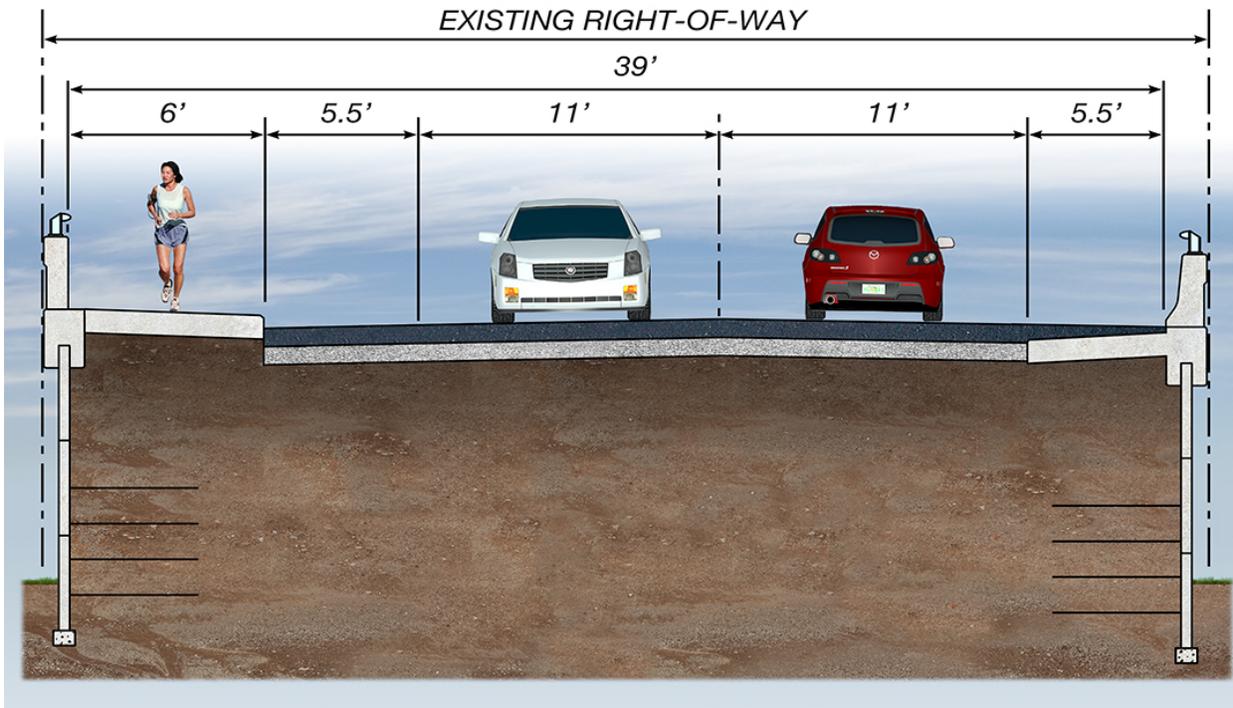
Proposed Roadway Section East of Proposed Fixed Bridge
